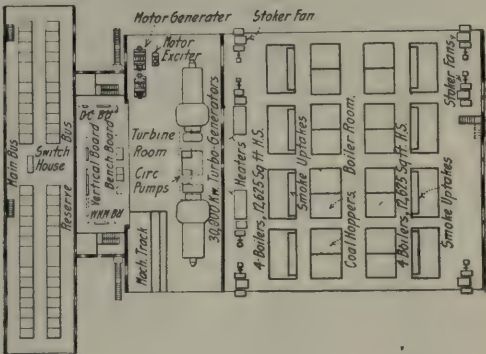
SIMPLIFIED PLAN OF WINDSOR PLANT SHOWING COMPLETE LAYOUT OF TWO UNITS OF STATION EQUIPMENT
